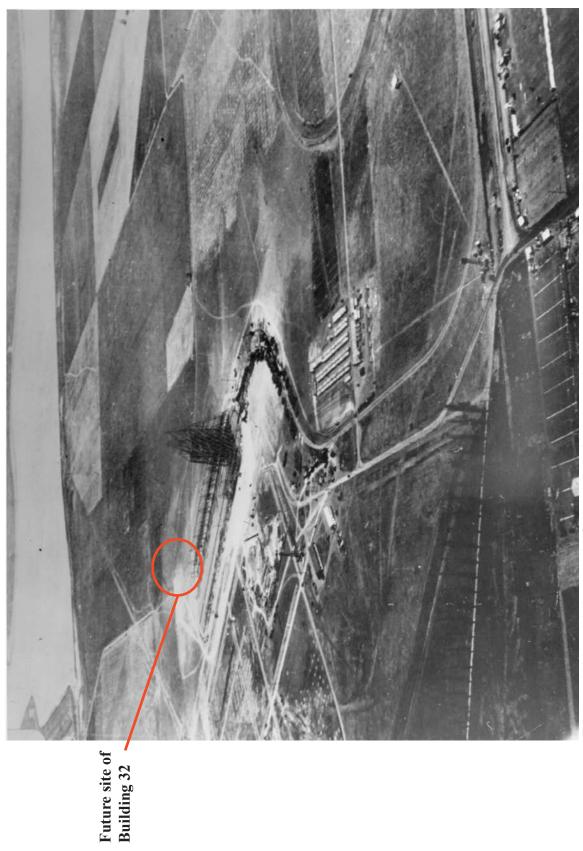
1931 aerial photograph of Hangar 1 under construction.
